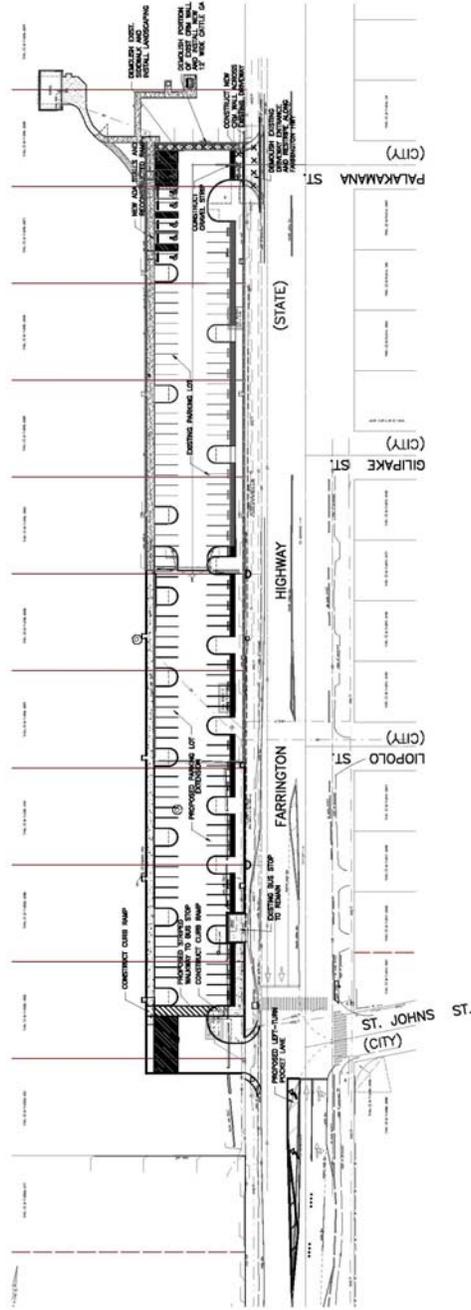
Current General Site Plan Including Existing Lot (courtesy ATA, Inc.)
